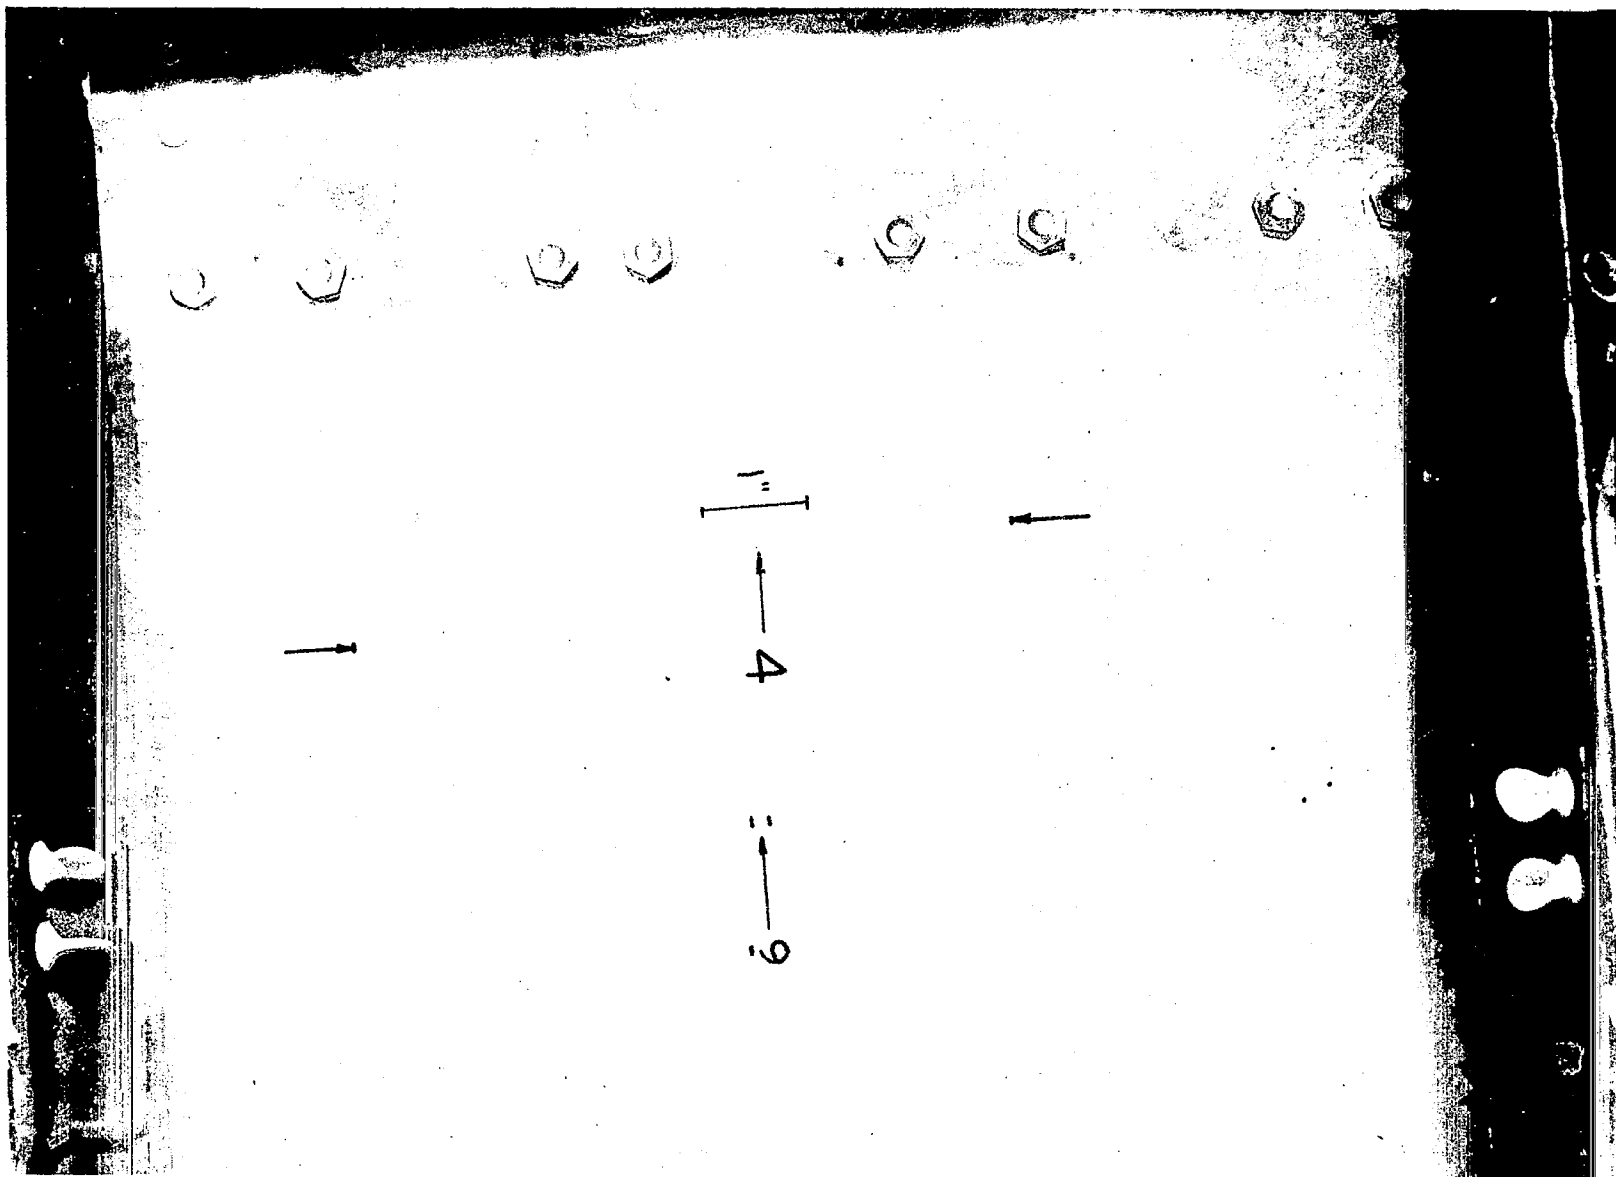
Photograph Showing Crack No. 4, Specimen No. 1
